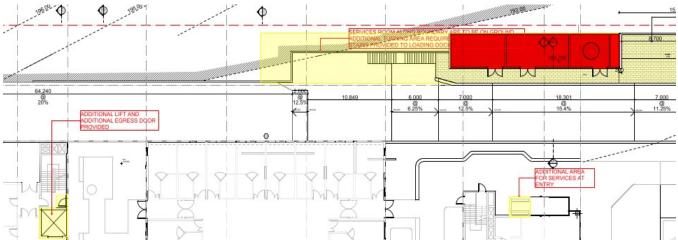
Extract of Proposed Plans with red highlight showing proposed provision of structures within the north-eastern side setback area.
